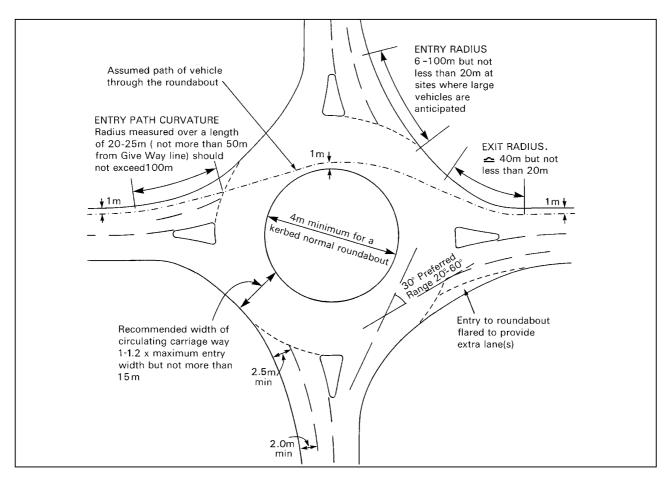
Typical layout of a conventional roundabout showing entry details.
